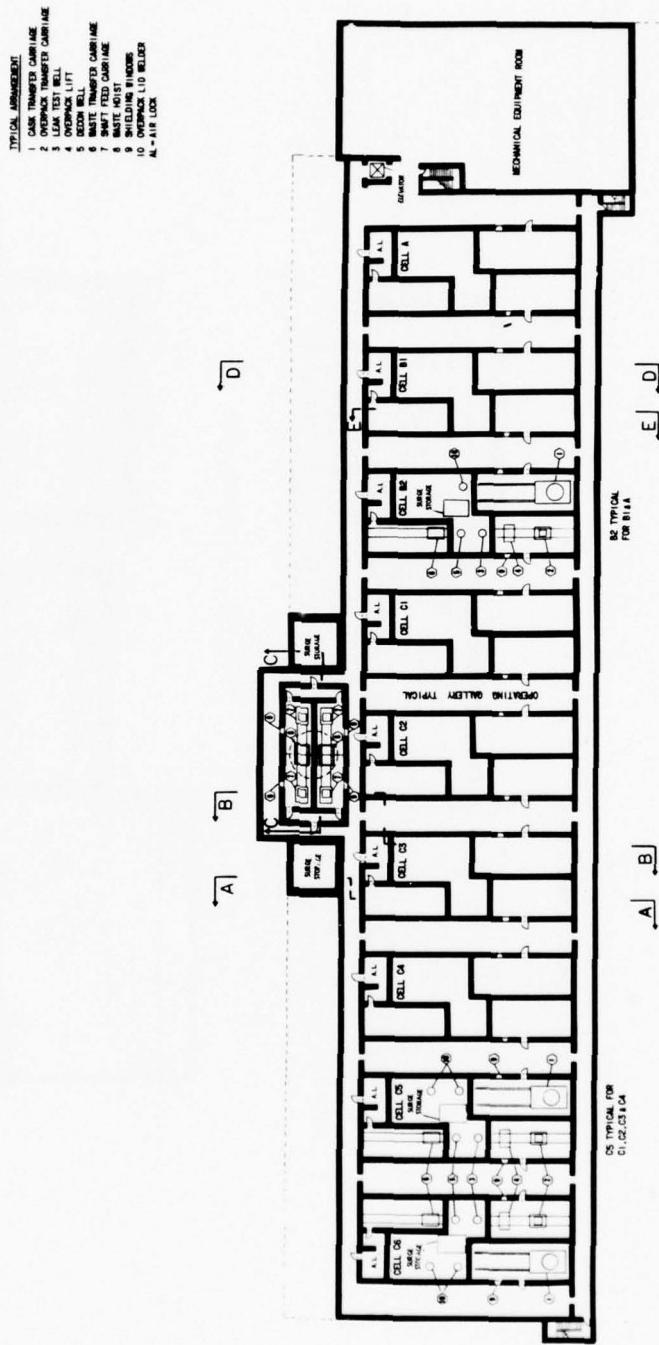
Canistered Waste Building Basement Plan, Reprocessing Fuel Cycles IIb and III Repositories in Salt
